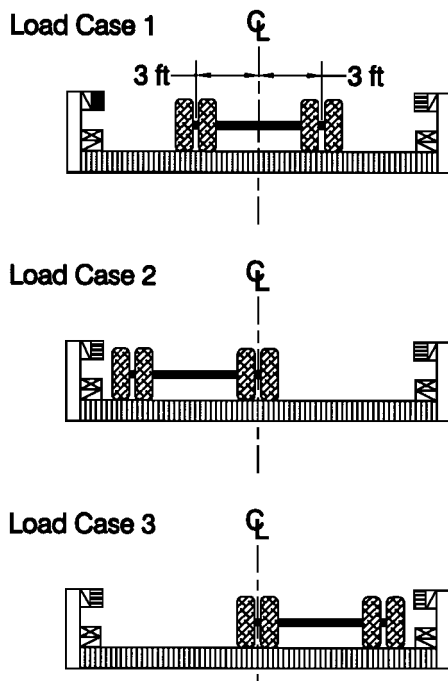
Transverse load cases (looking west) used for all static-load tests on the Big Erick's bridge.
